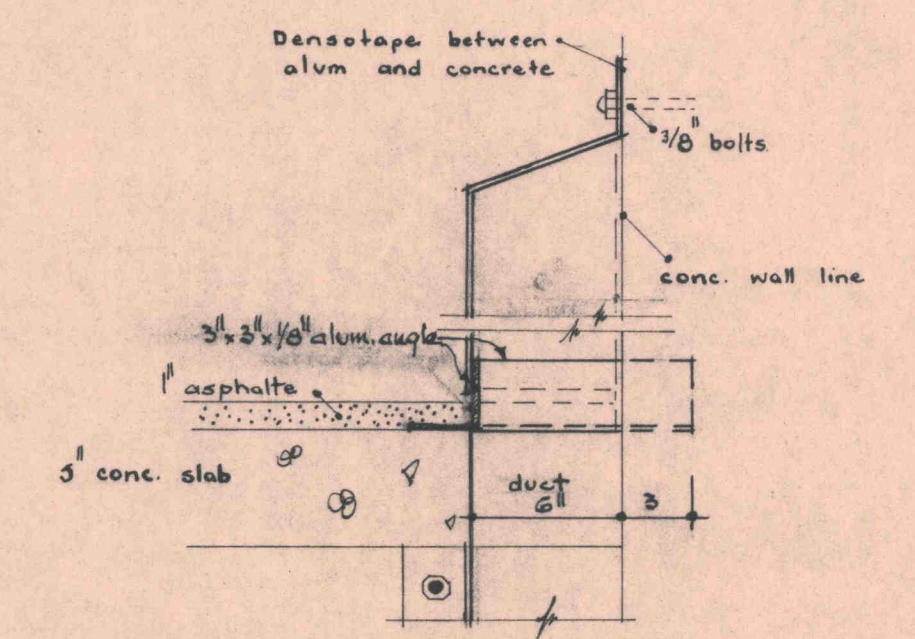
DETAILS OF HANDRAIL AT TANK BLOCK B (see also 1/2" scale drgs.)
